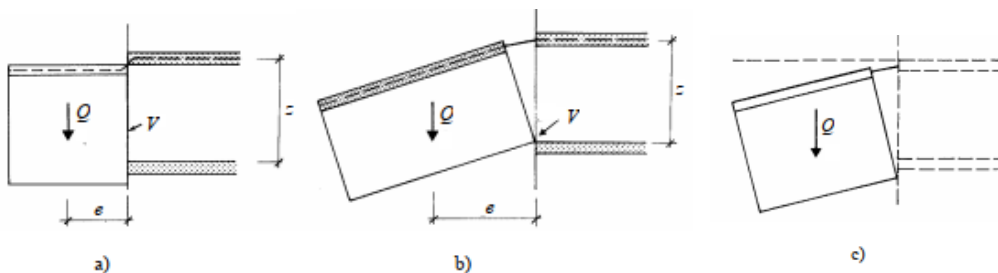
Examples of collapse mechanisms for a cantilevering wall above a damaged area, a) joint slip mechanism, b) rotation mechanism, c) combined slip-rotation (fib, 2008)
